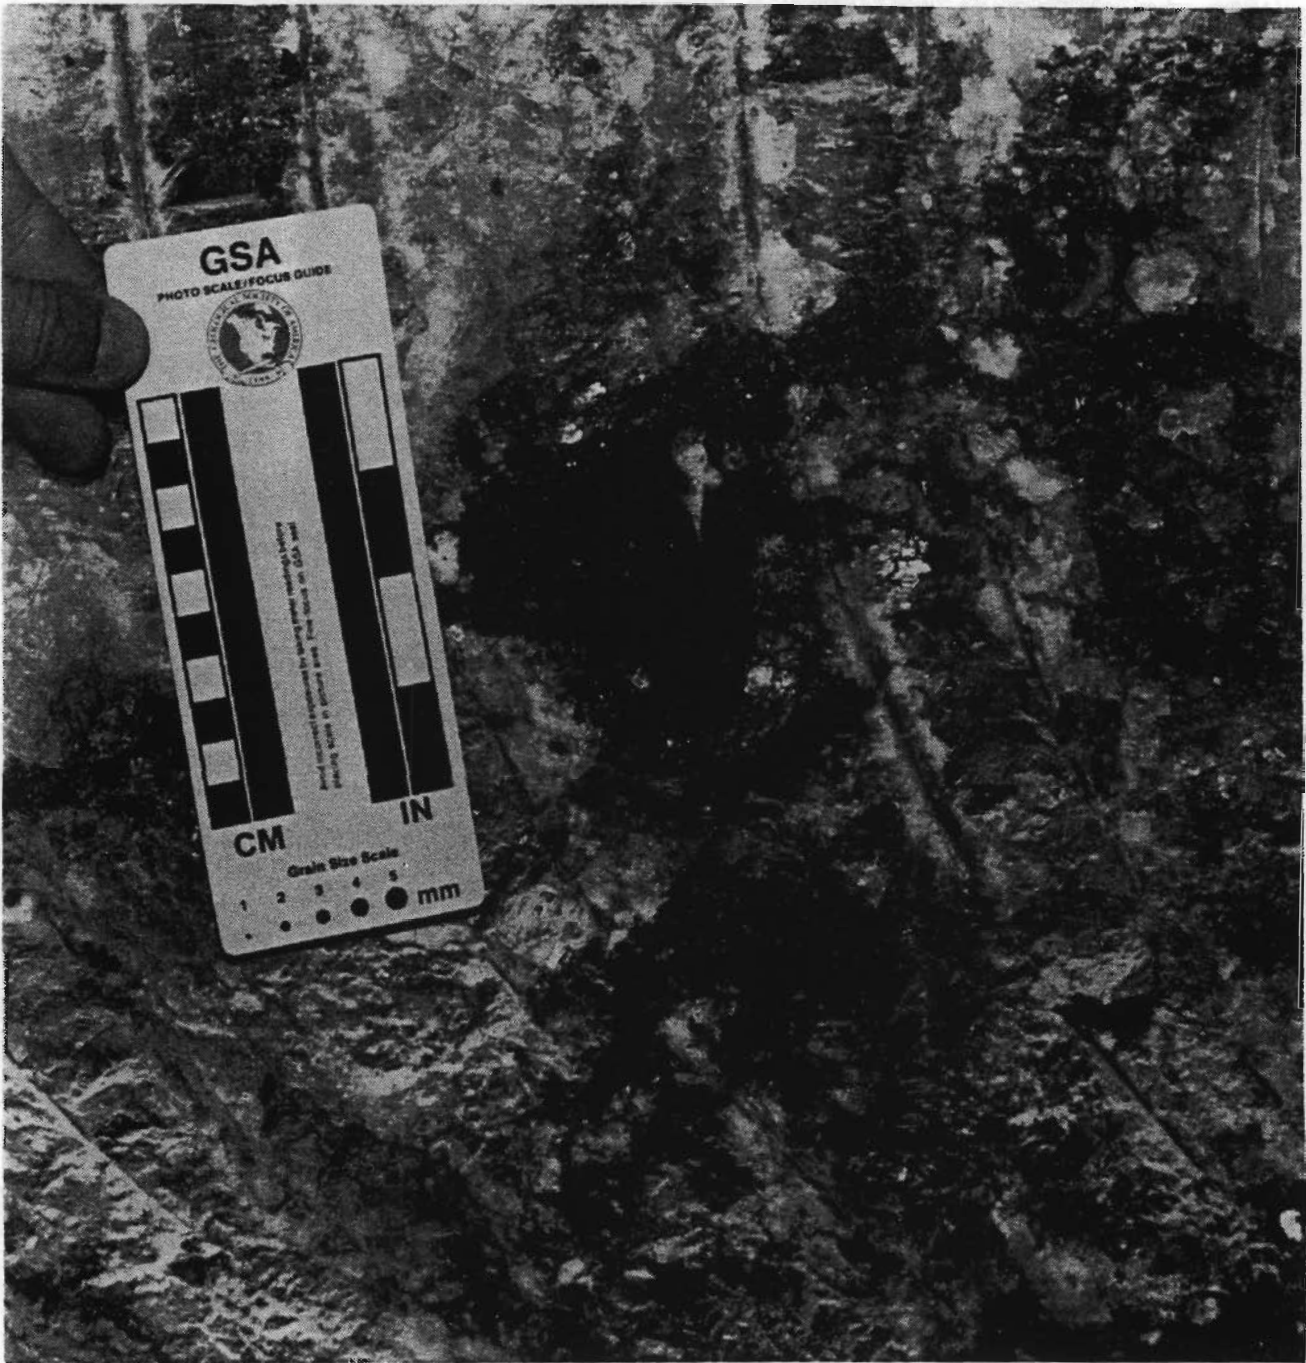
CLOSE-UP OF CLAY IN EXCAVATION WALL.
